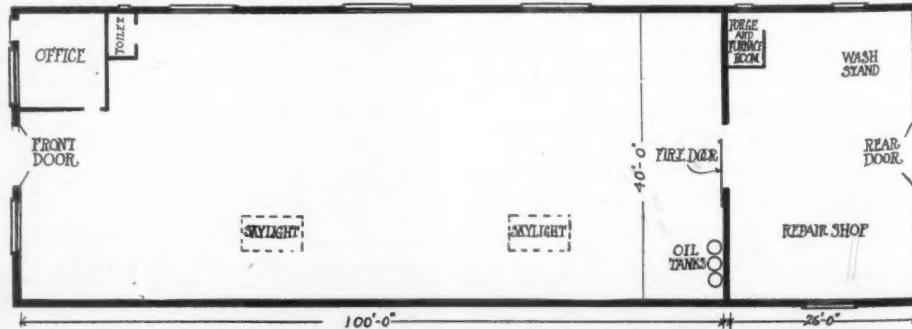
FLOOR PLAN OF PUBLIC GARAGE
